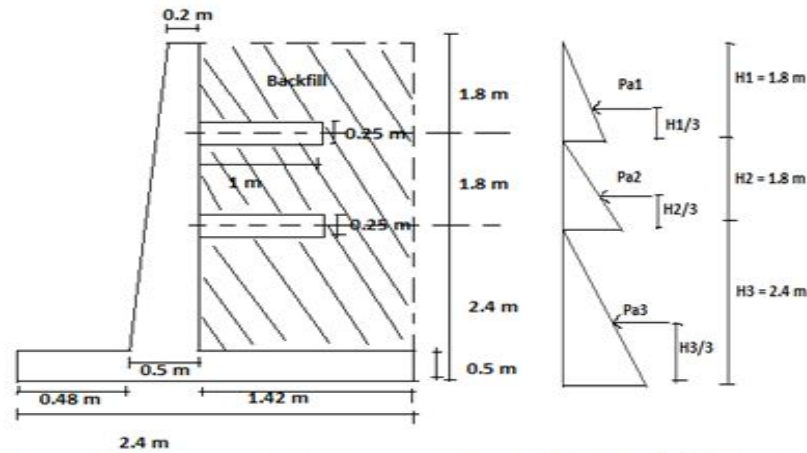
Retaining wall with two shelves Pressure diagram
